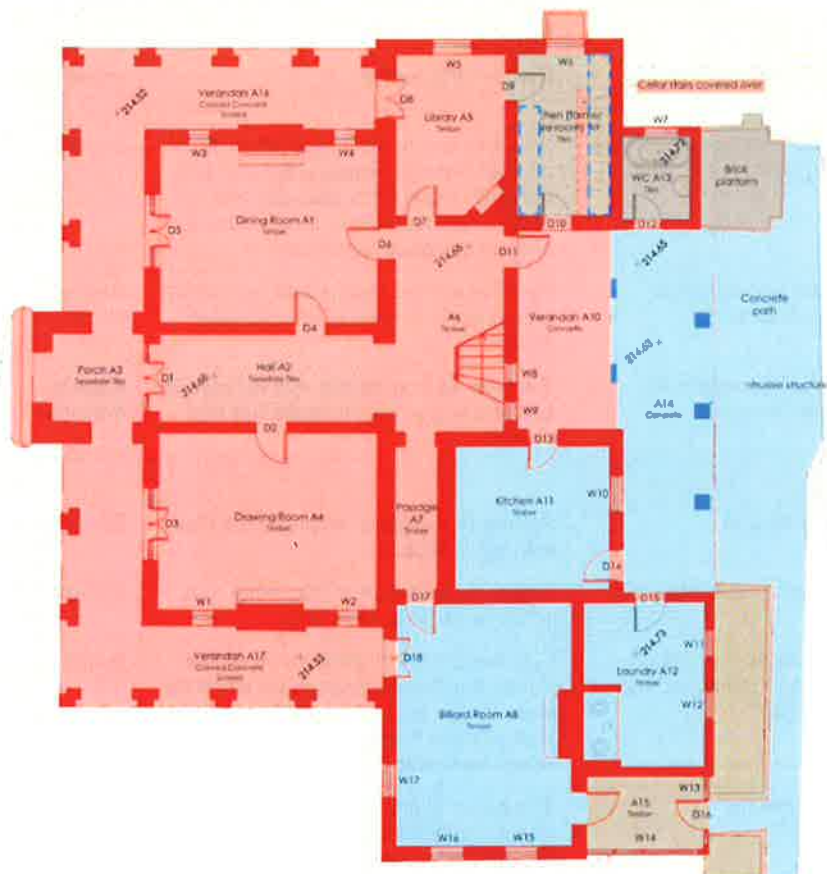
Jenner Ground Floor Plan showing gradings of significance for building elements, n.d.
